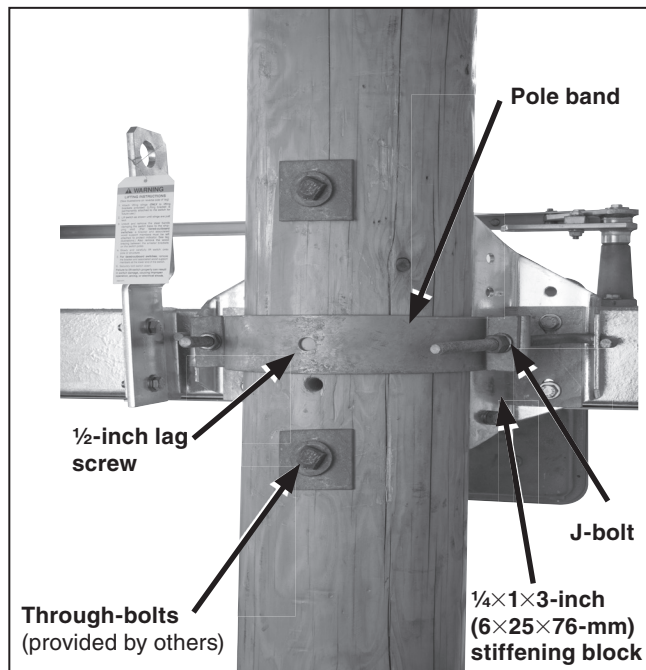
Securing pole band to mounting bracket (upright mounting configuration shown).
